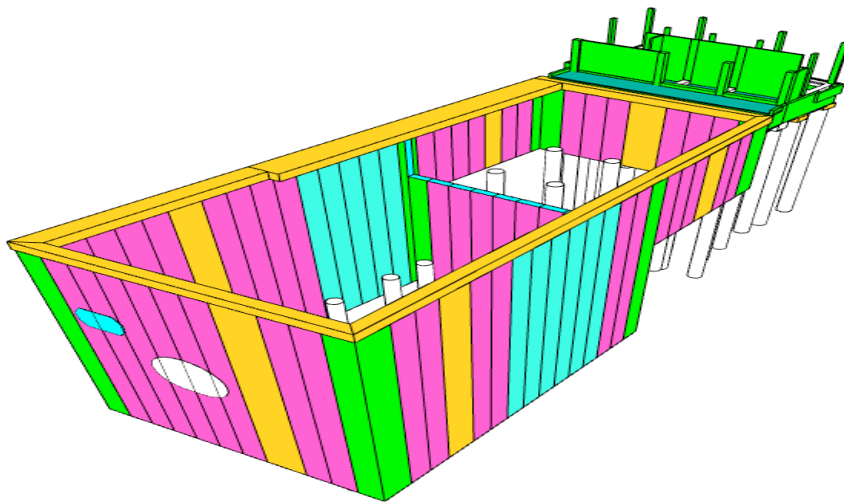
3D CAD drawing of Dean Street station (Arup (2011)).
